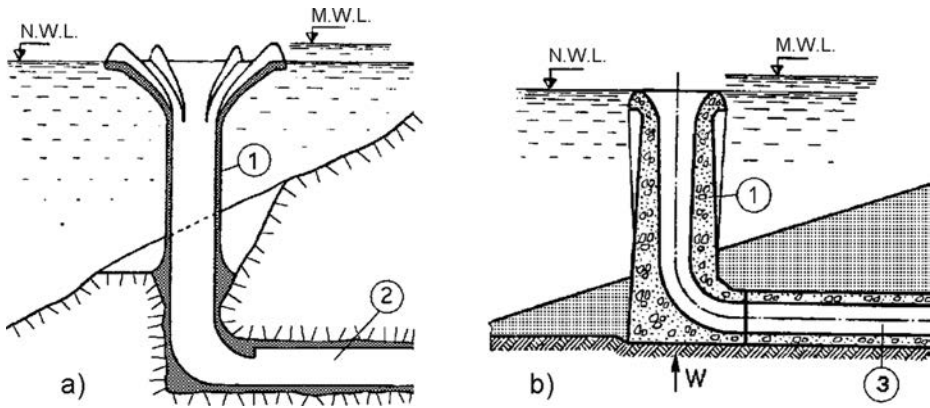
Spillway structure in the form of a tower with offtake in the form of an outlet tunnel (a) and gallery through the dam's body (b). (1) Tower; (2) tunnel; (3) gallery.
